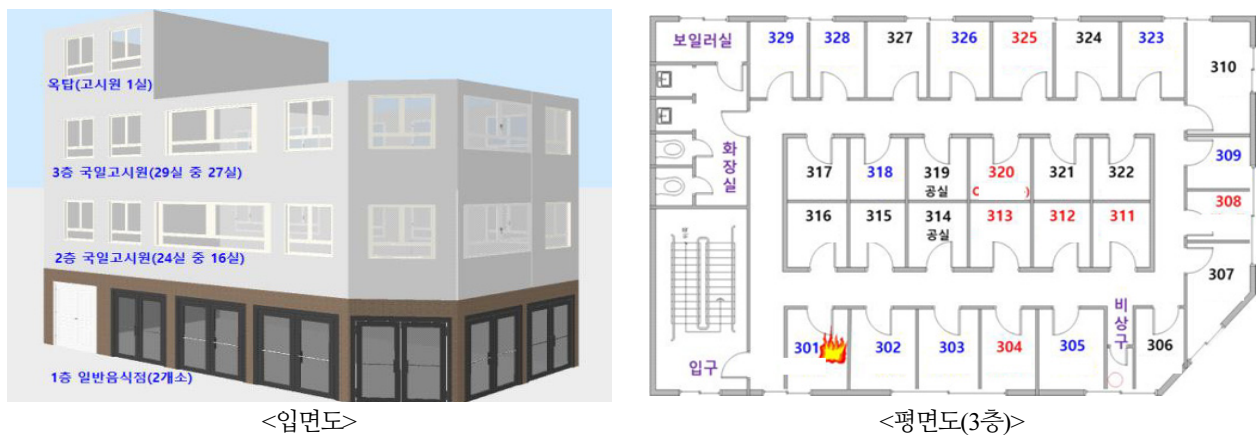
Elevation and floor plans related to Kookil Gosiwon (Fire situation report)
